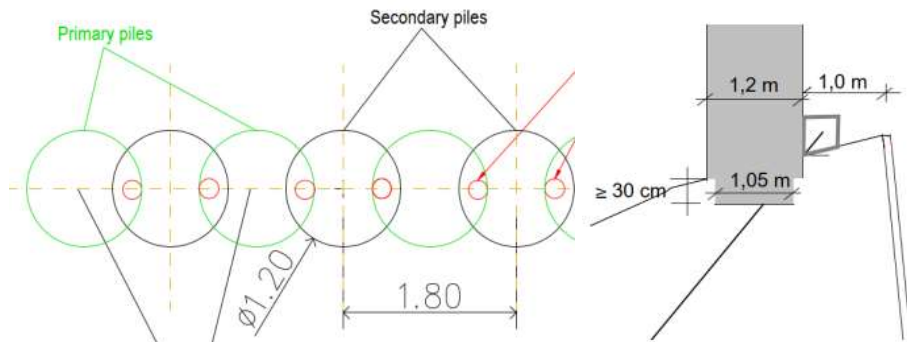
Left - lay-out of the secant pile wall including steel casing in each secondary pile for further curtain grouting. Right - requirement for rock socketing.
